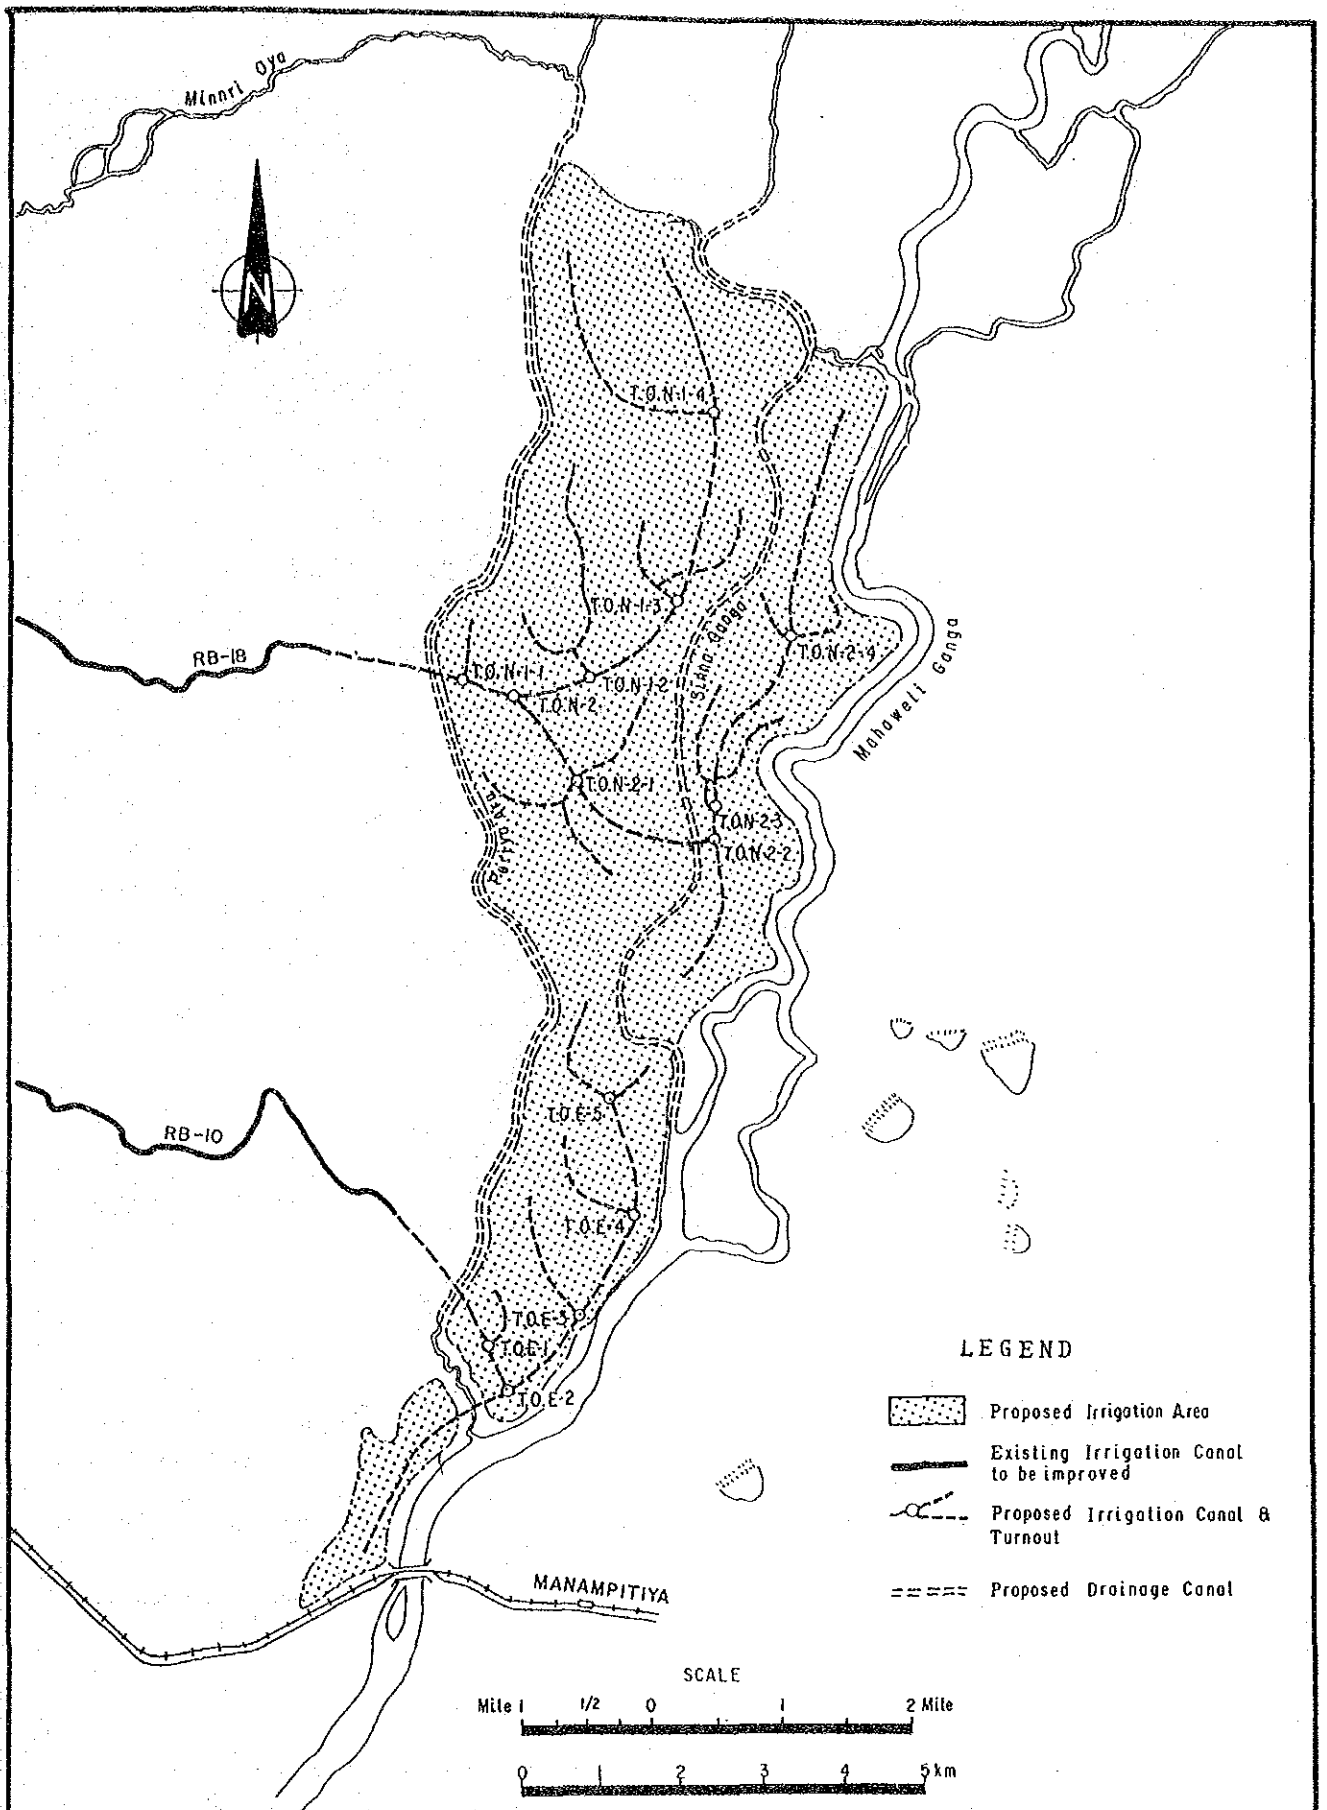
(2/3) Irrigation and Drainage Layout
